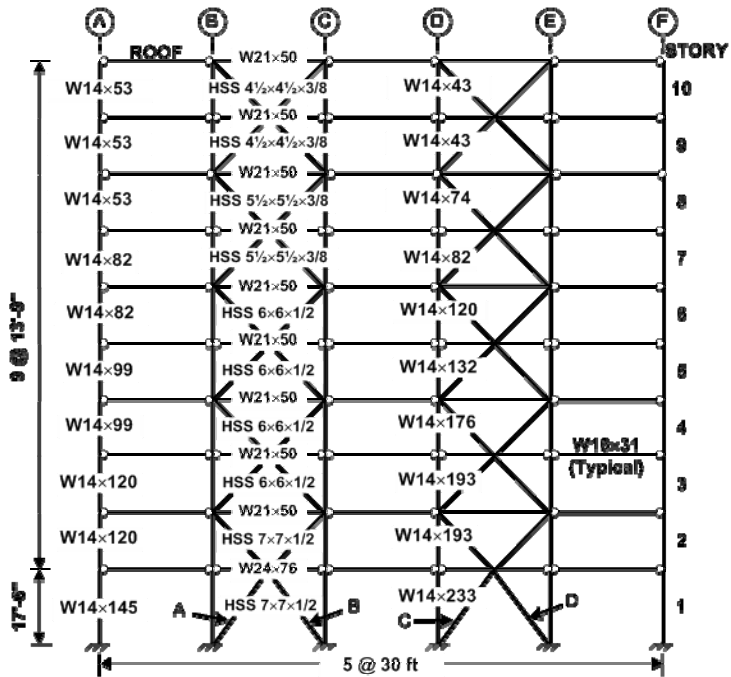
SCBF Building Frame (SDC-C): E-W Elevation (Line 6)
